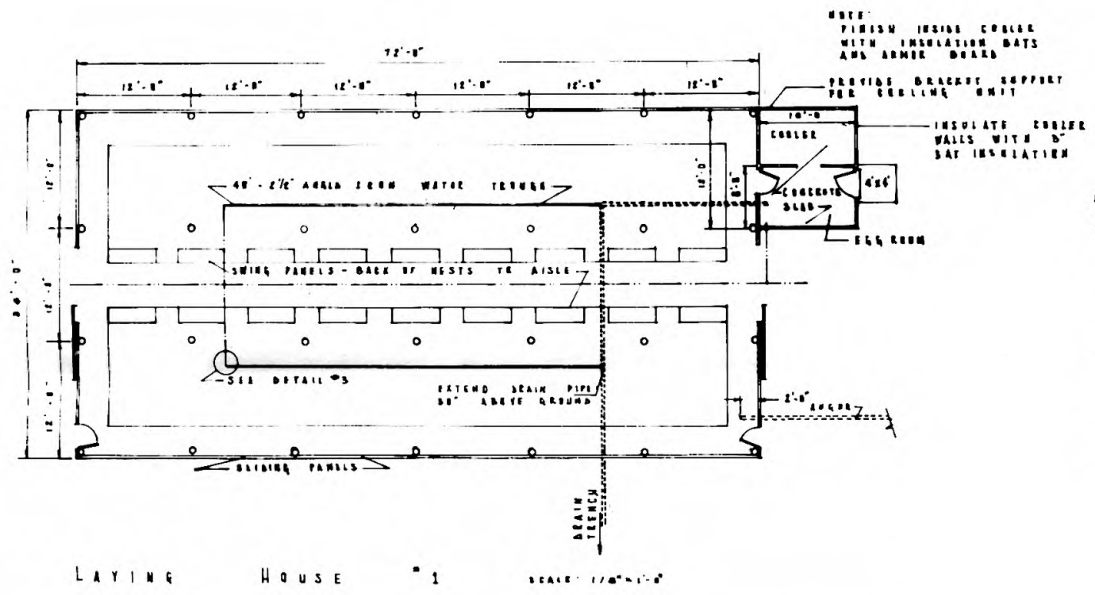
A. Plans for the 36' x 72' Kansas pole-type poultry houses and equipment.
